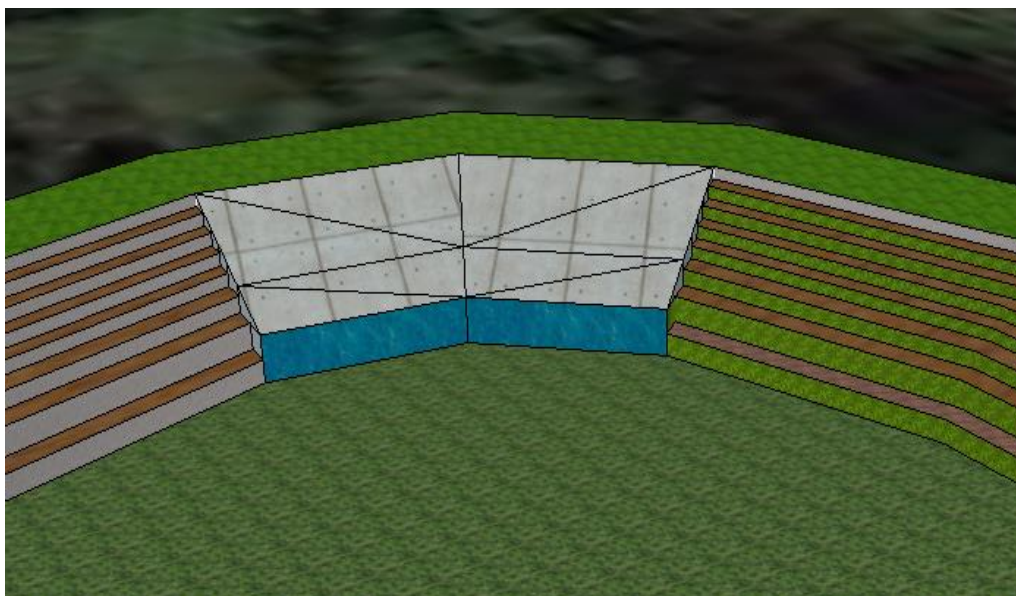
Inlet Design Front View (Dry Pond Facility)
